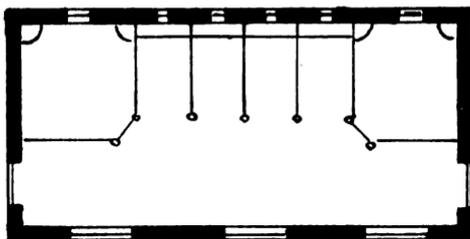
Ground Plan of Stable with Four Stalls and Two Boxes. Single row.
